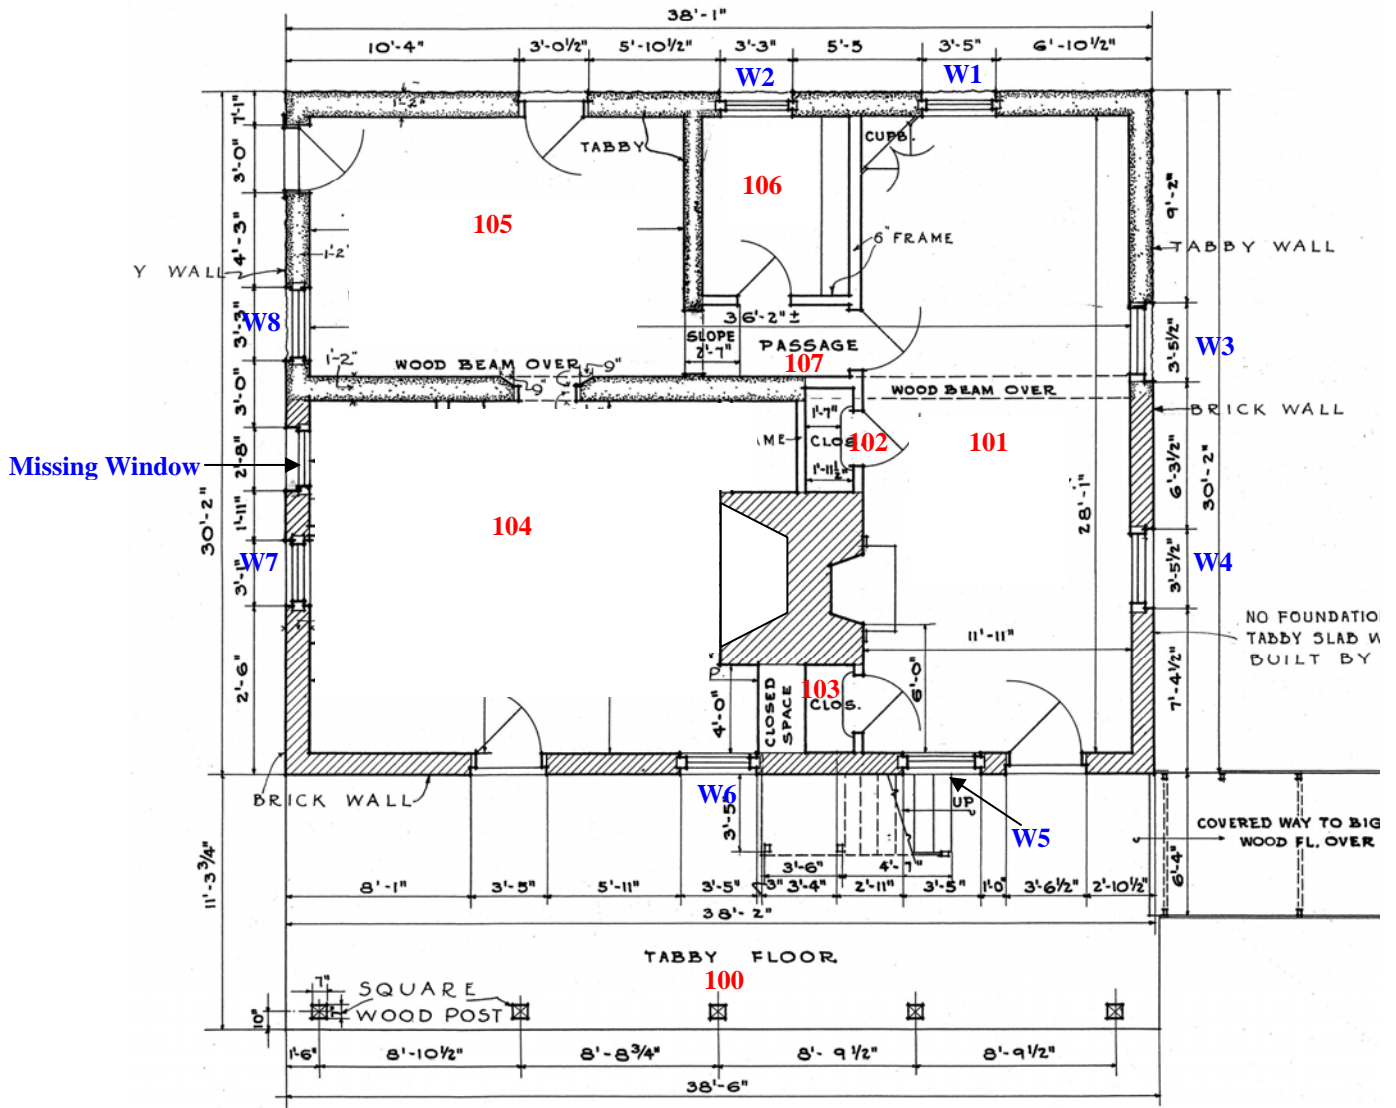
Location of windows on first floor (modified 1934 HABS drawing)
